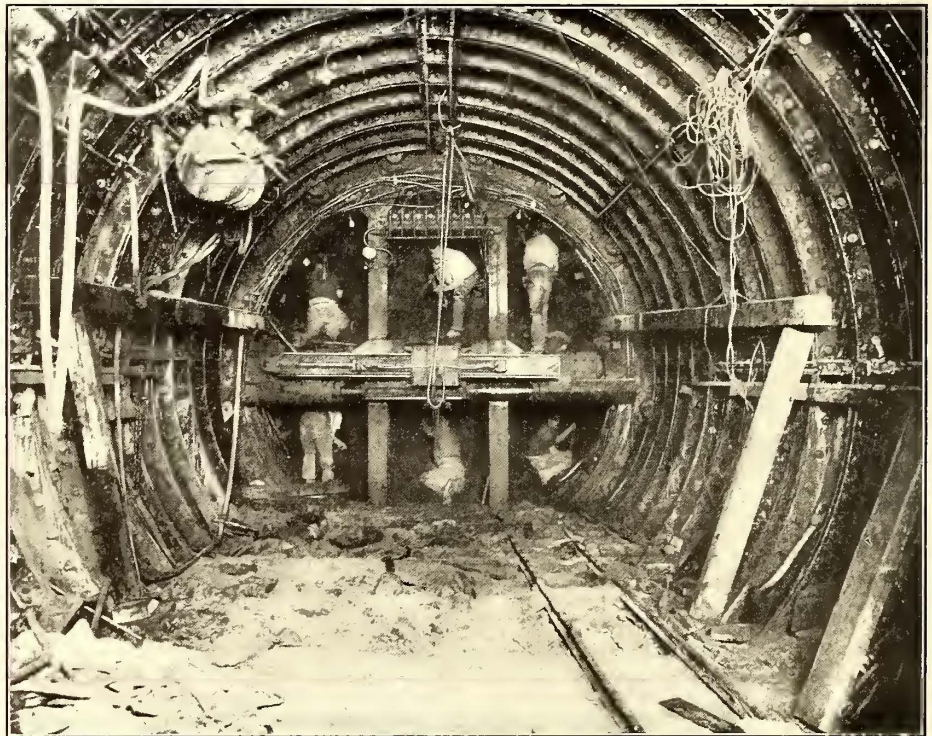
VIEW INSIDE SHIELD ON STRAIGHT TRACK. SHOWING METHOD OF DRIVING
